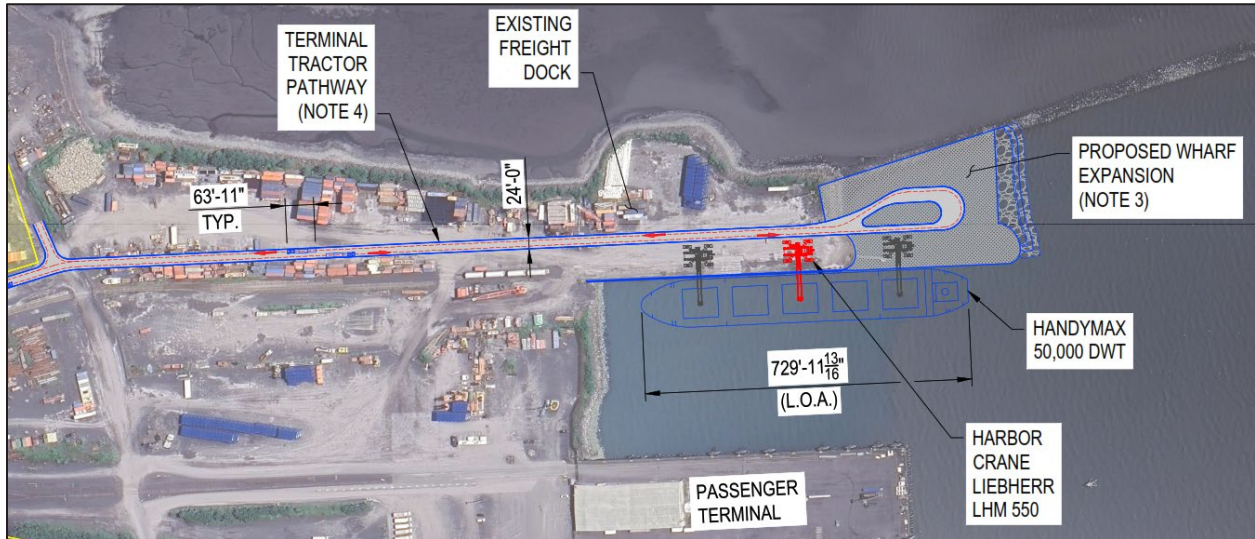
Seward Proposed Site Plan: Dock Area Detail
